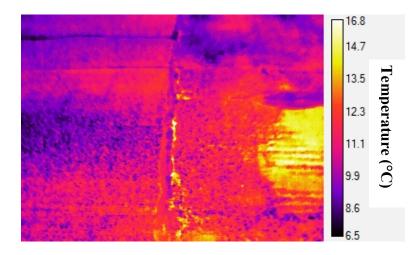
Asphalt and concrete pavement surface temperatures at 6:30 a.m.
